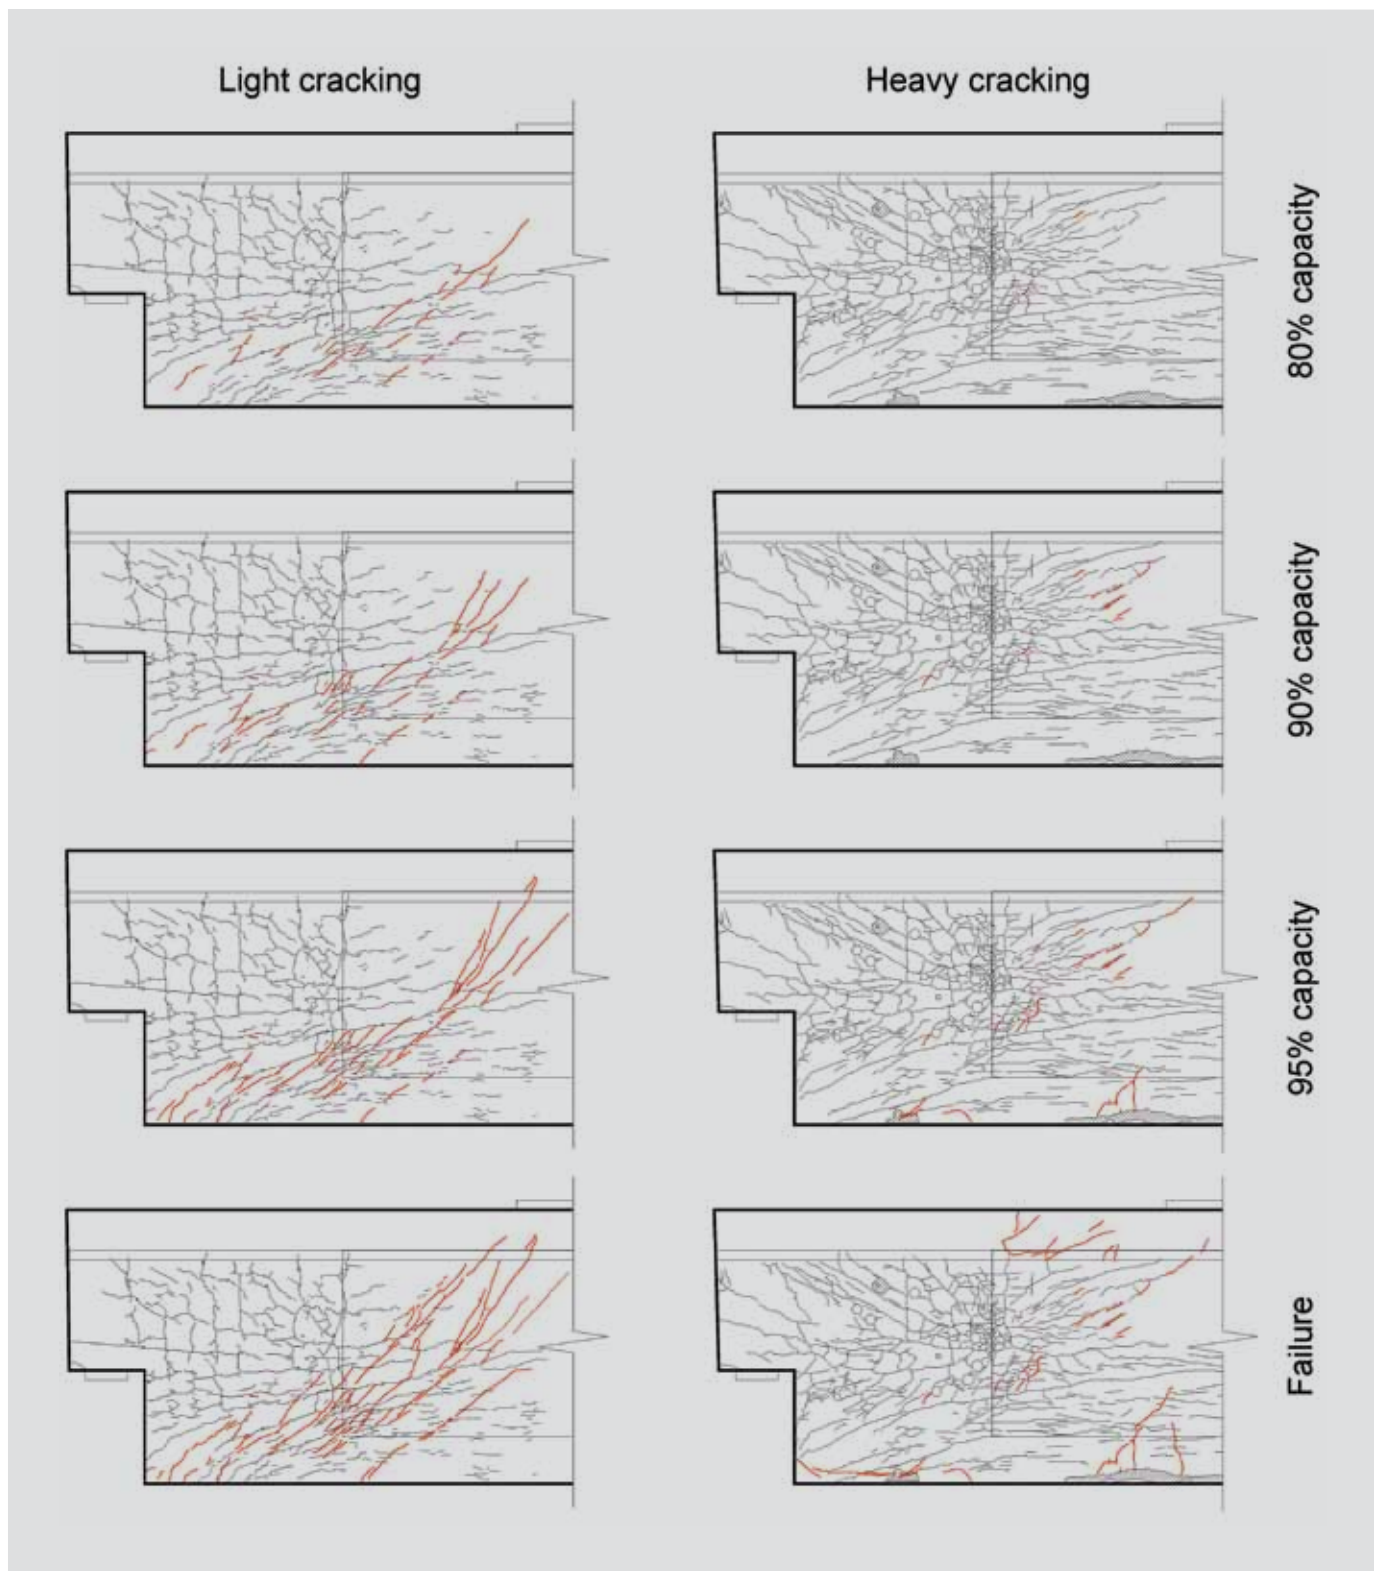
Diagonal cracking on the lightly and heavily damaged specimens.
